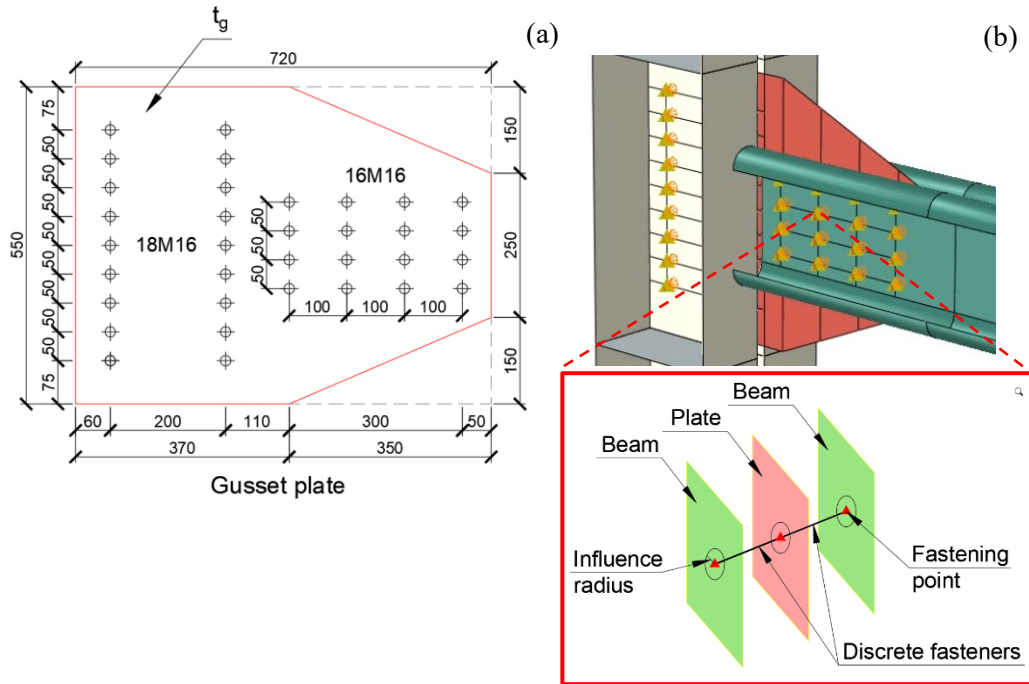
FE modelling of the tested connections: a) bolt arrangement and b) discrete fastener
